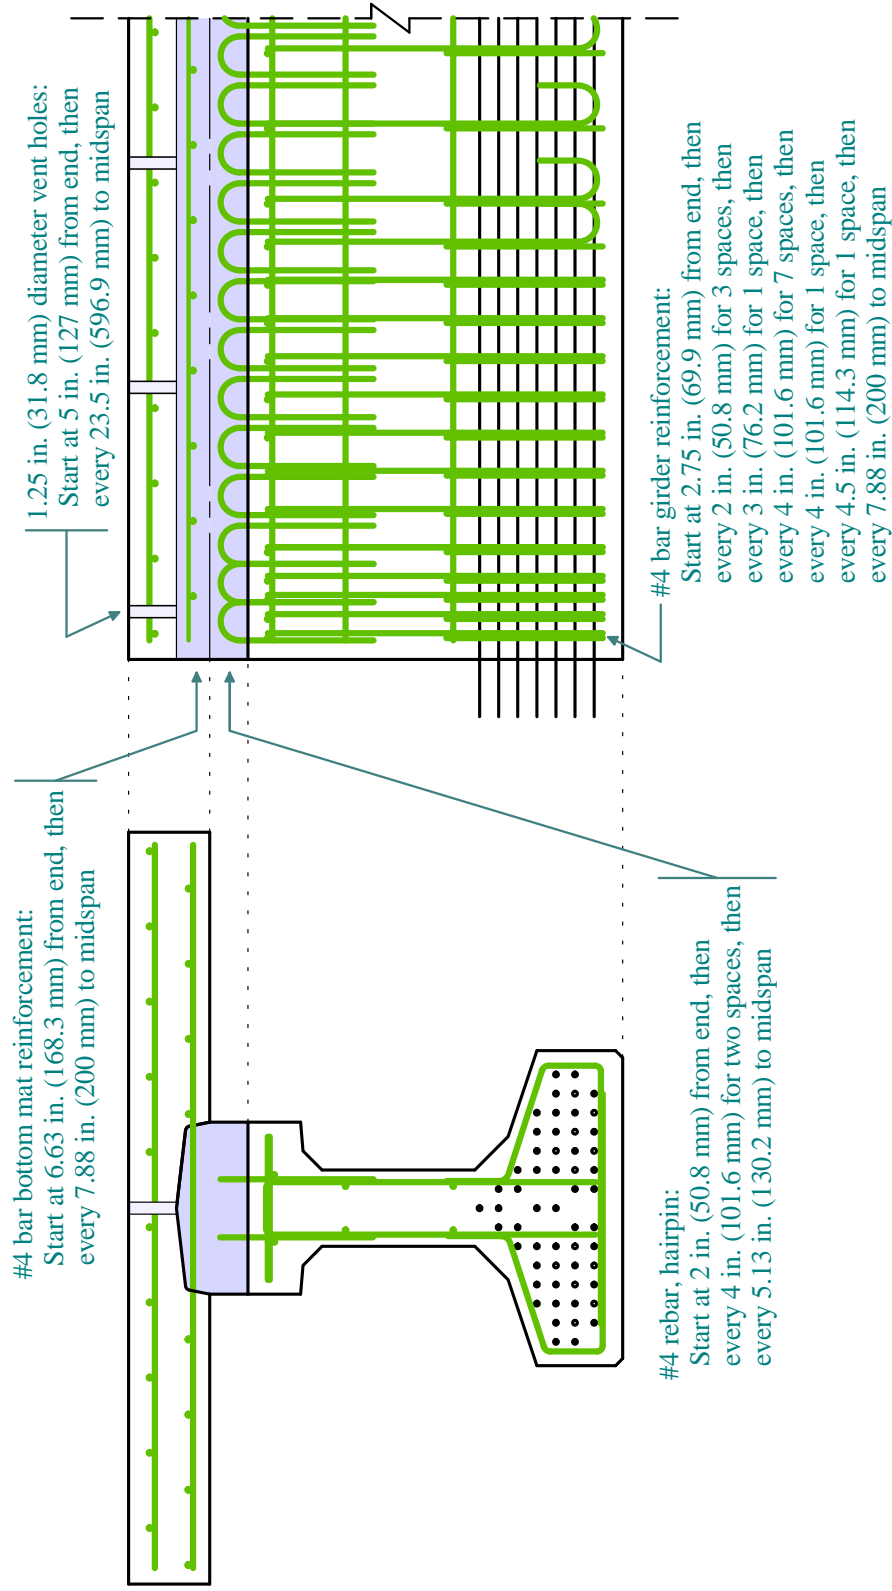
Illustration. UHPC composite connection: Longitudinal cross section of concrete girder connection.
